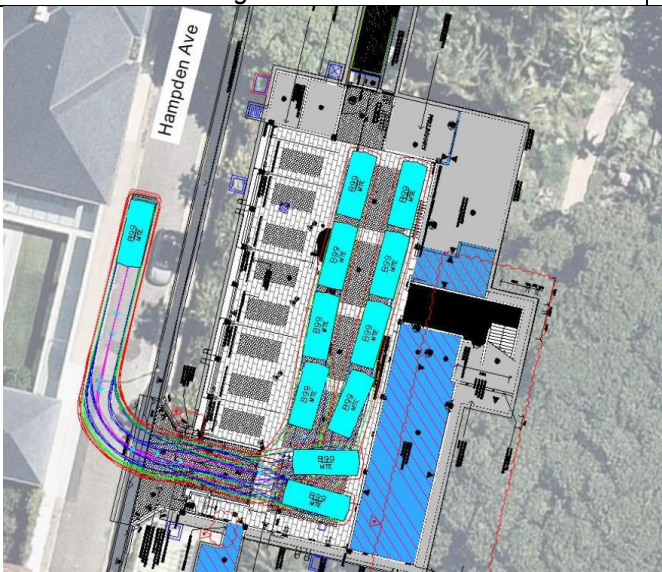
10 car spaces to the basement car park accessed via Hampden Ave.
